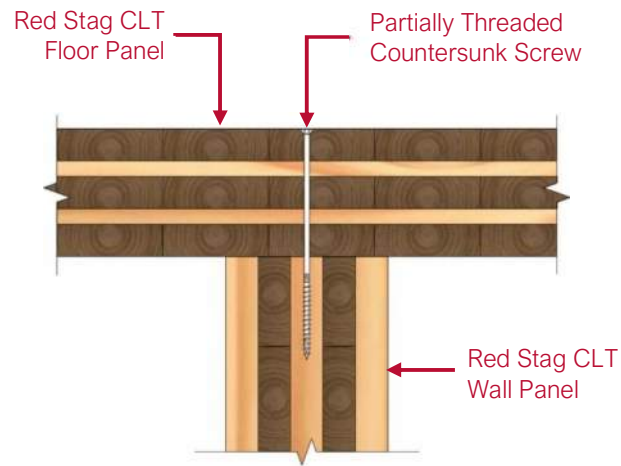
Red Stag CLT floor panel to Red Stag CLT wall panel connection.
